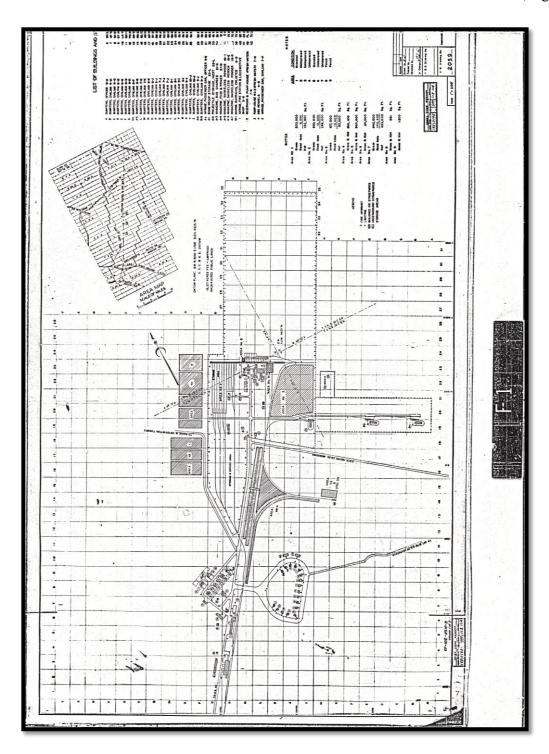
INL drawing number 112114 (CF-102-USN-11); storage yard, frame 1 of 2; June 1943.
